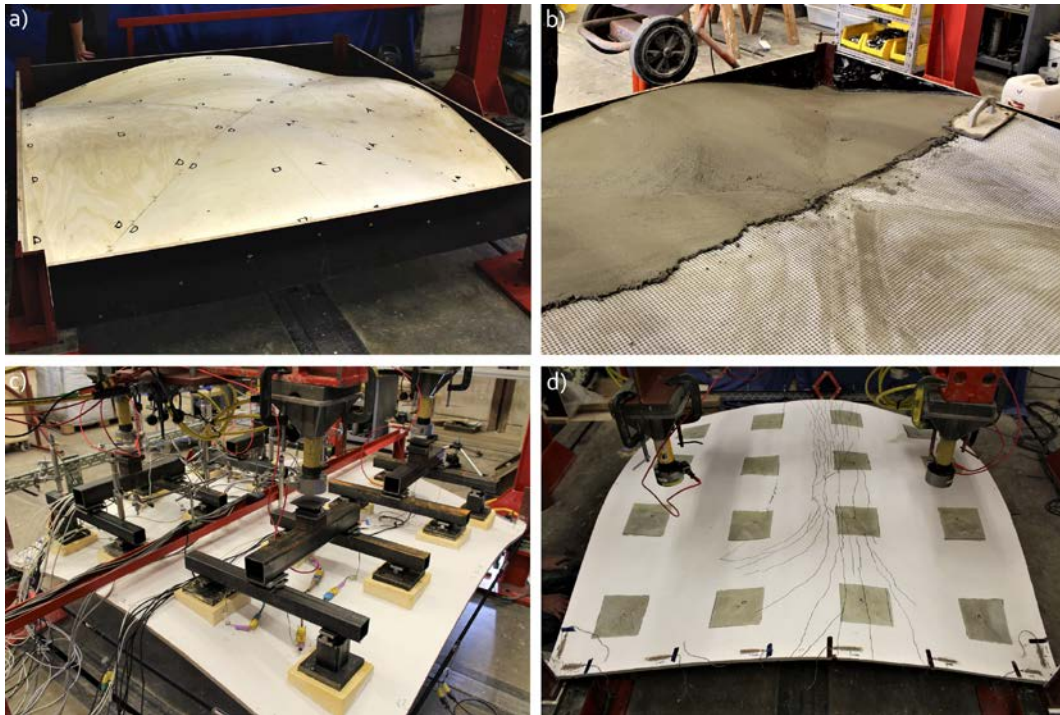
Physical prototyping, showing a) timber formwork, b) shell construction, c) loading apparatus and d) shell crack patterns after testing.
